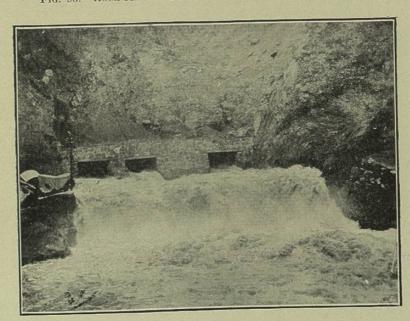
Waialua Dam, Hawaii, Showing Flood Discharge through Outlet Tunnels during Construction, under Head of 8 Feet at Upper End of Tunnels.
